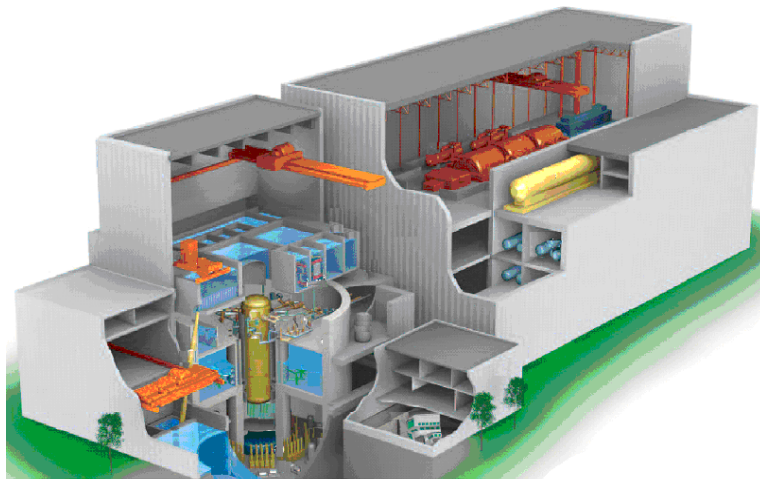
A schematic of the ESBWR plant design (*ESBWR fact-sheet, 2007*).
